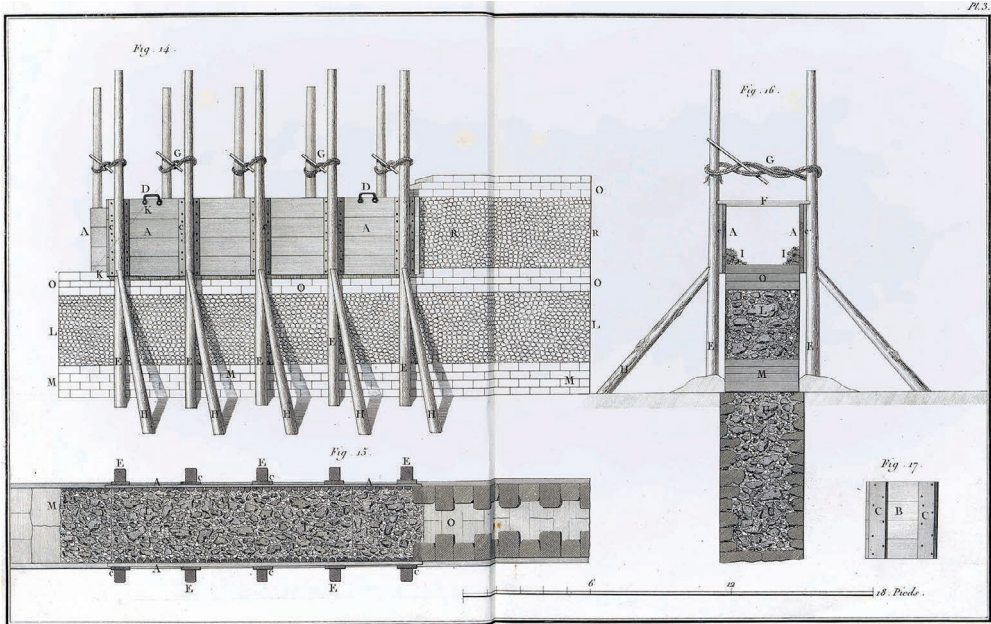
Plan, elevation and cross-section of concrete pebble masonry with removable wooden formwork (Fleuret 1807: pl. 3).
